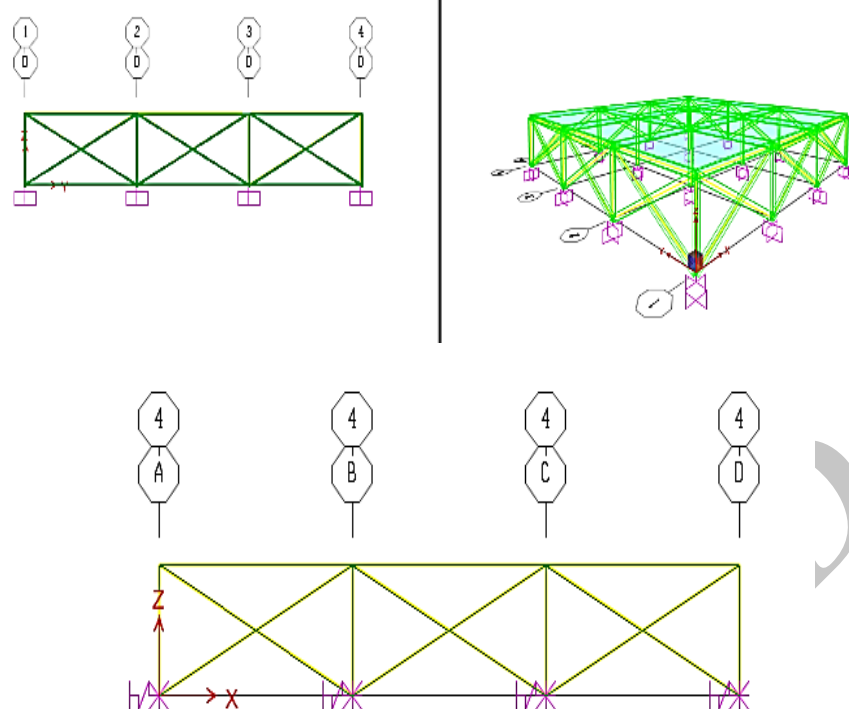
The 3-D view of the sliding building and the grid consisted of orthogonal girder and its supporting space truss
